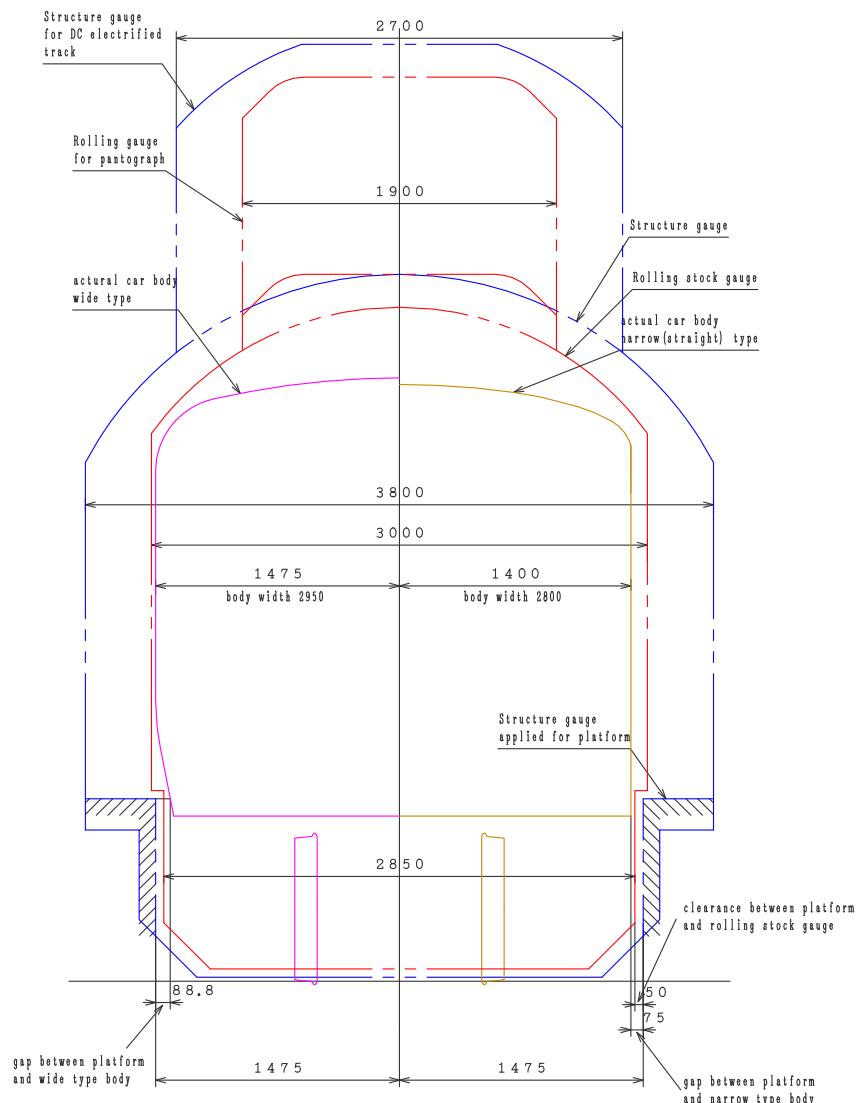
Construction Gauge and Rollins Stock Gauge of Japanese Railway
